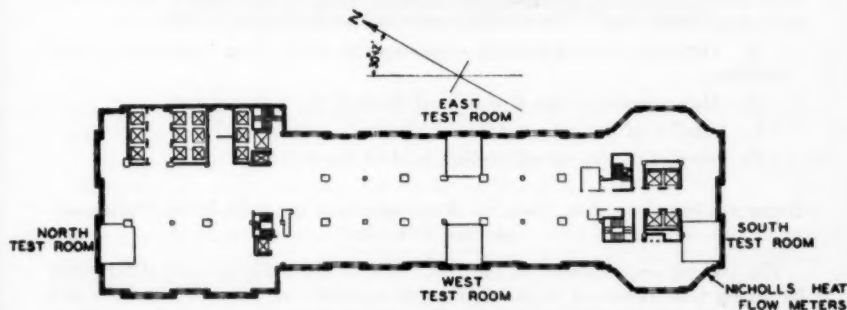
FLOOR PLAN OF BUILDING SHOWING TEST ROOMS
